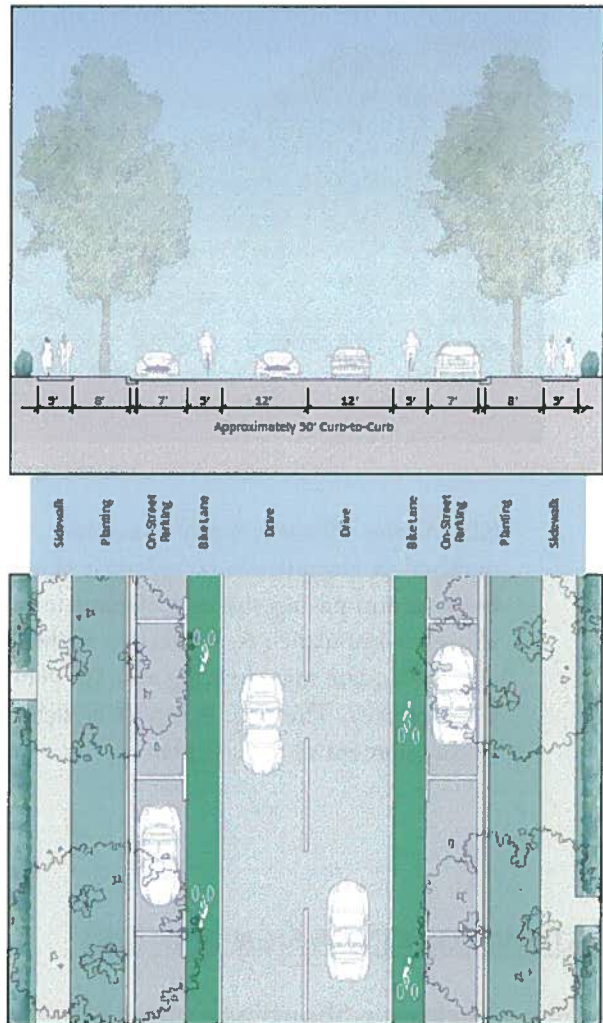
Street Sections – Illustrative Typical Section of Grace Street
